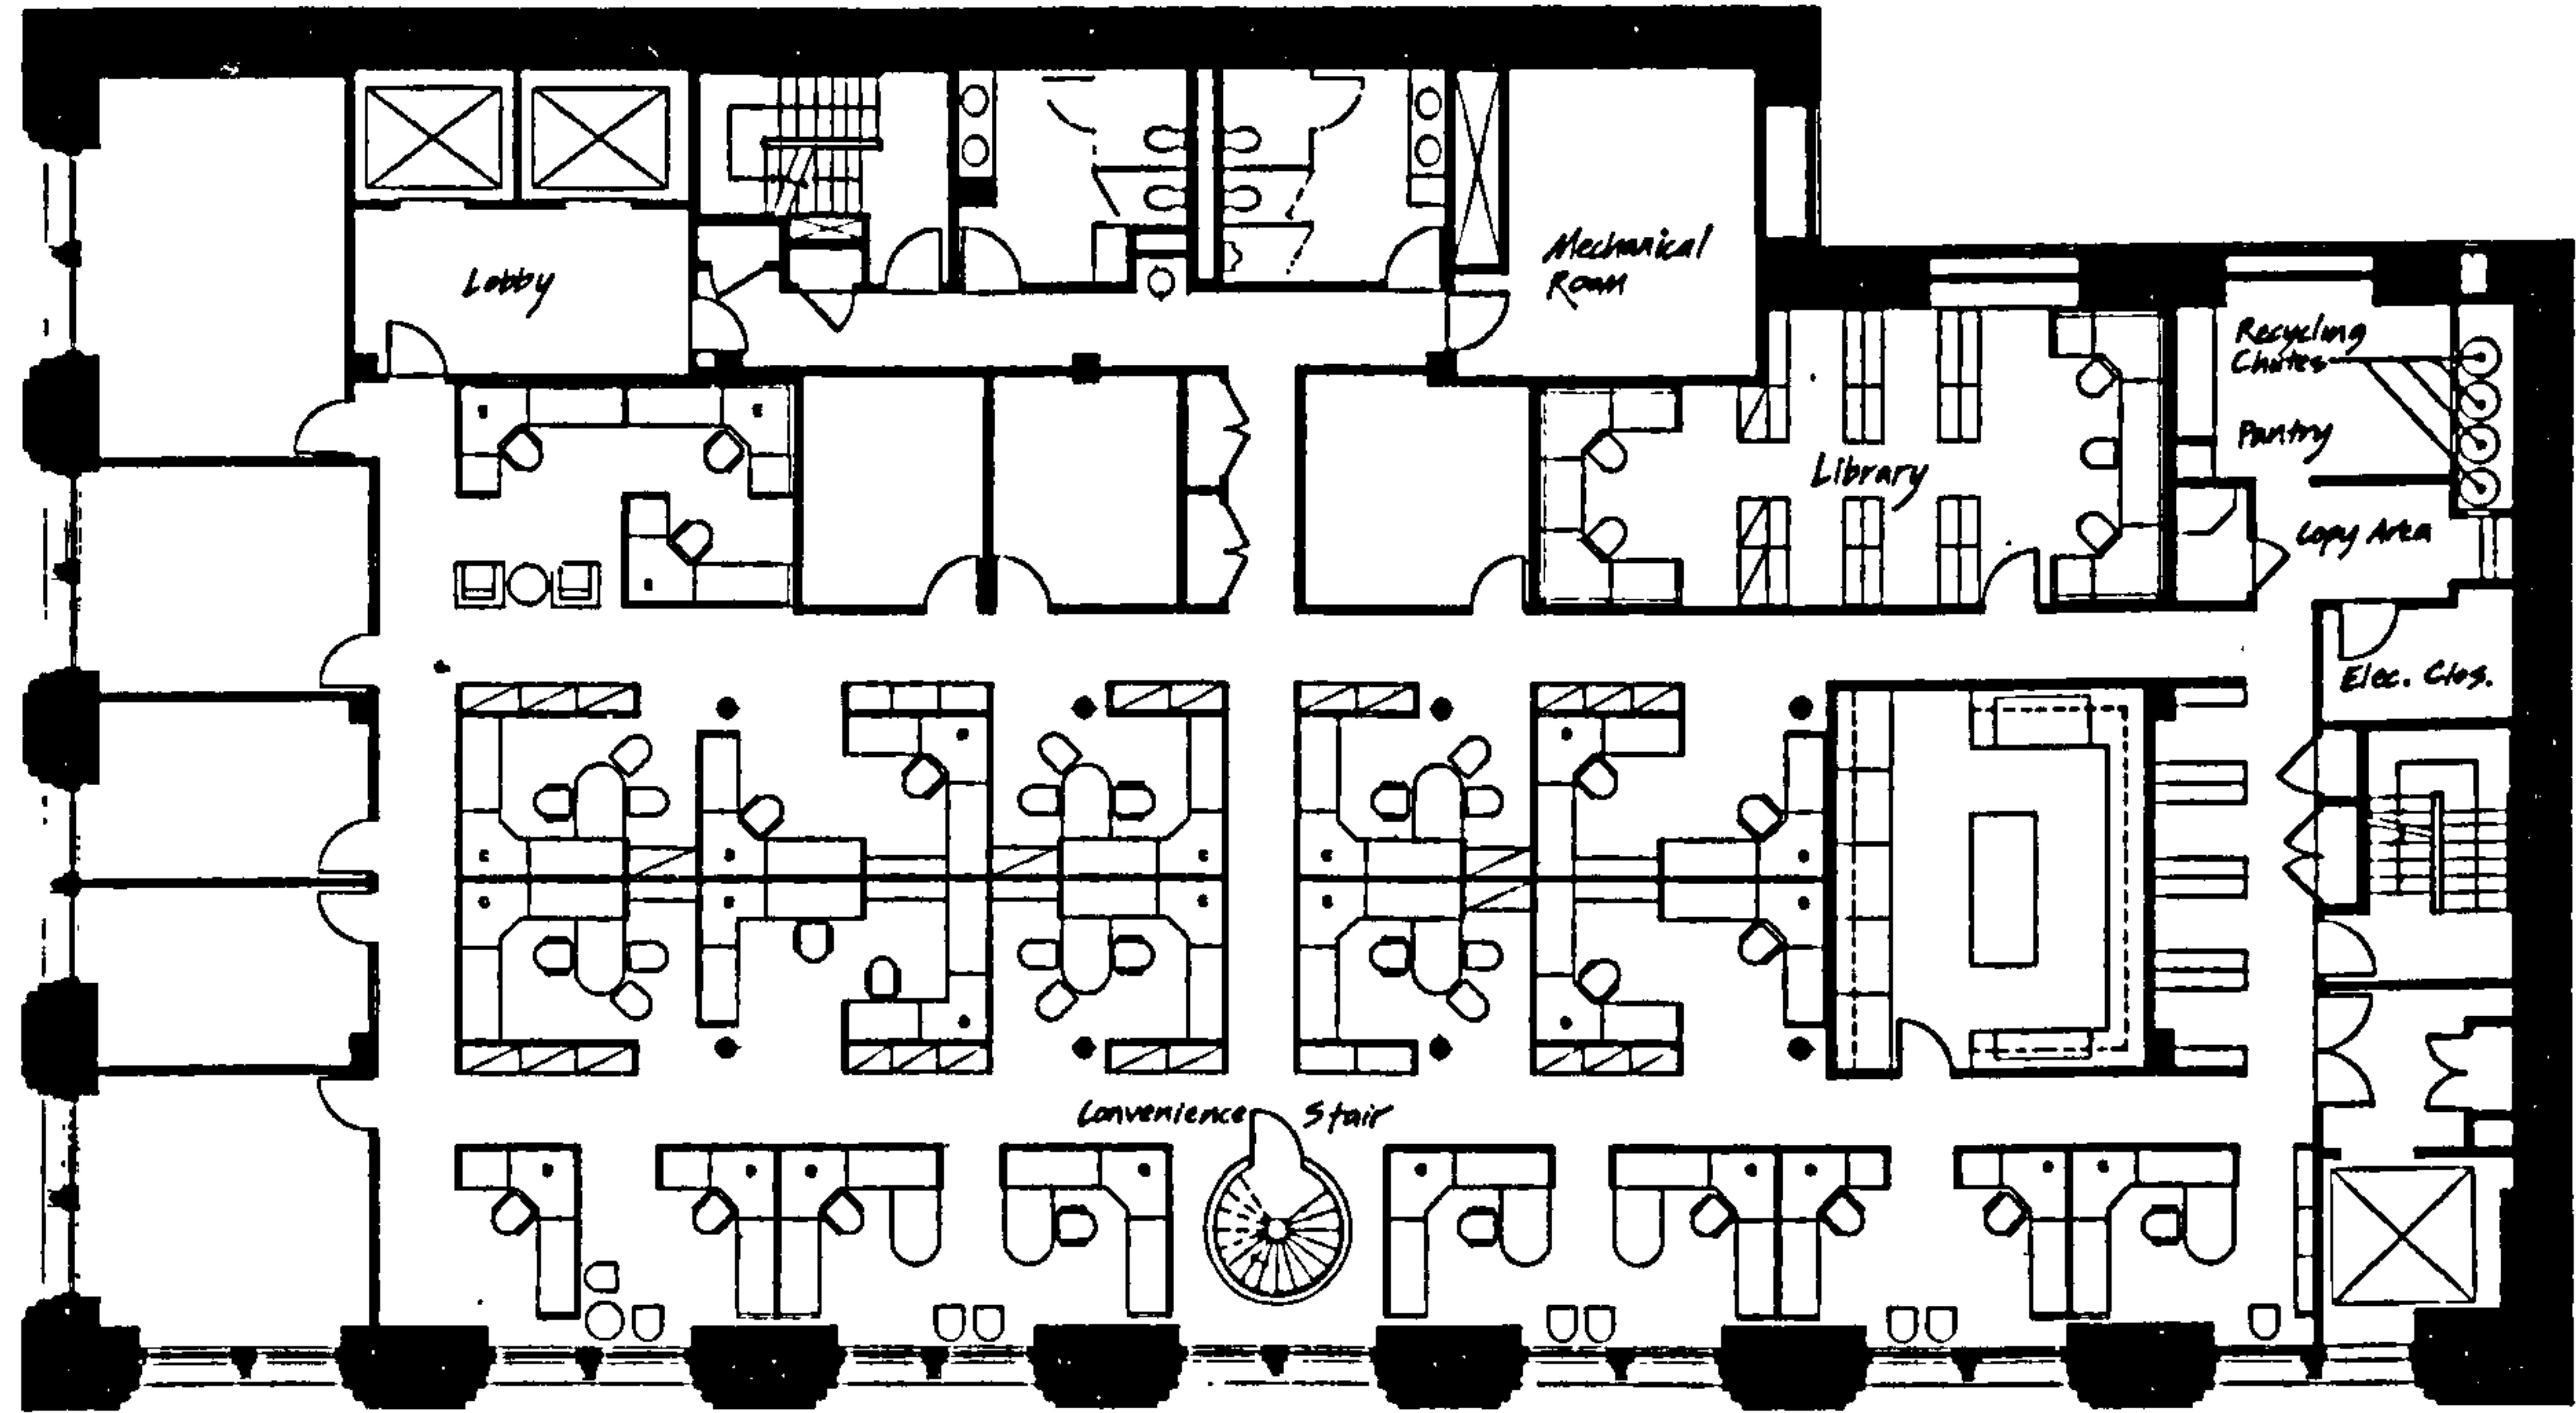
Typical floor plan at Audubon House.ⁱ
